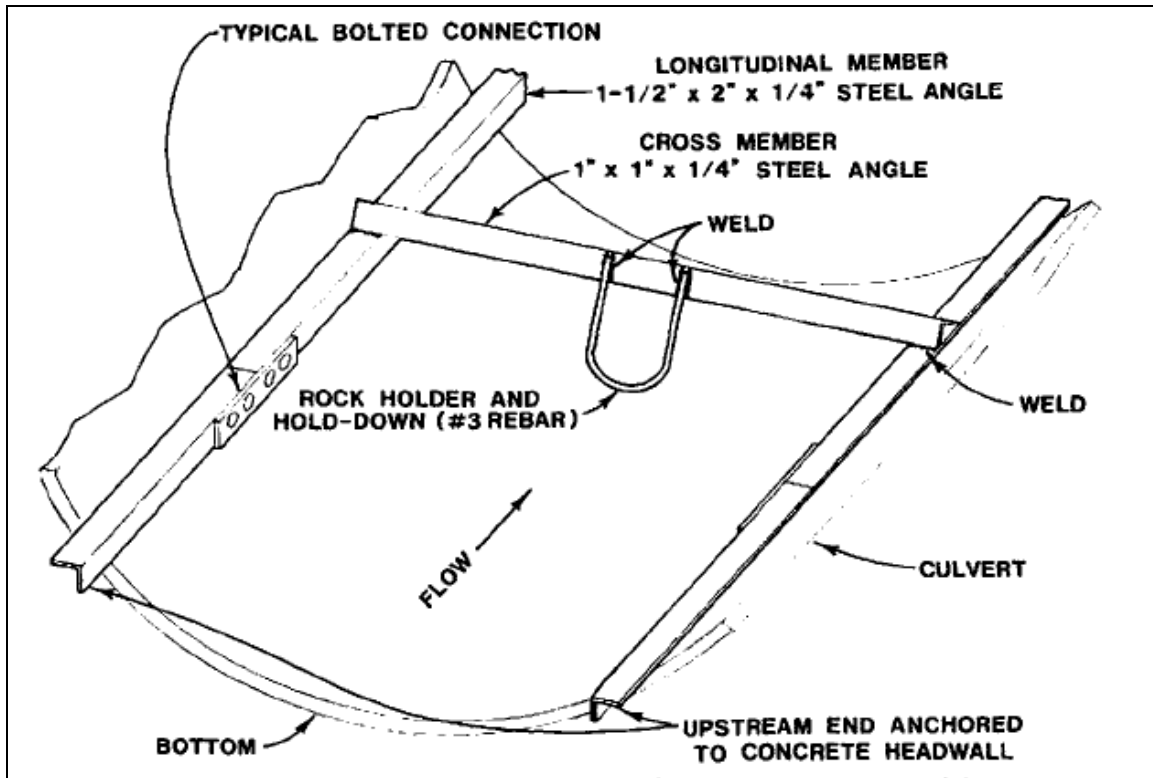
Detachable fishway design for culvert retrofit (Clancy 1990).
